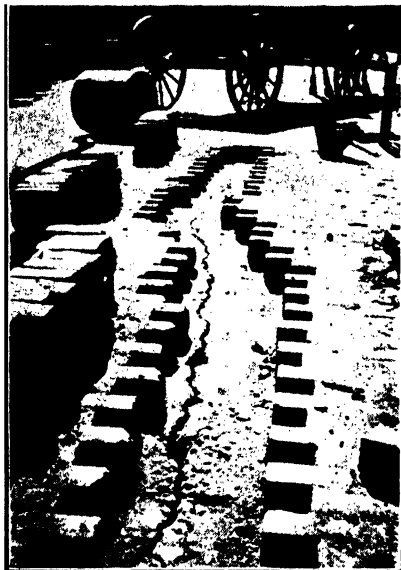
A crack in the base of a brick pavement. Mesh reinforcement would have prevented this crack from widening, the cushion from leaking, and the brick from settling. Repaired by cleaning out and filling with asphalt.
